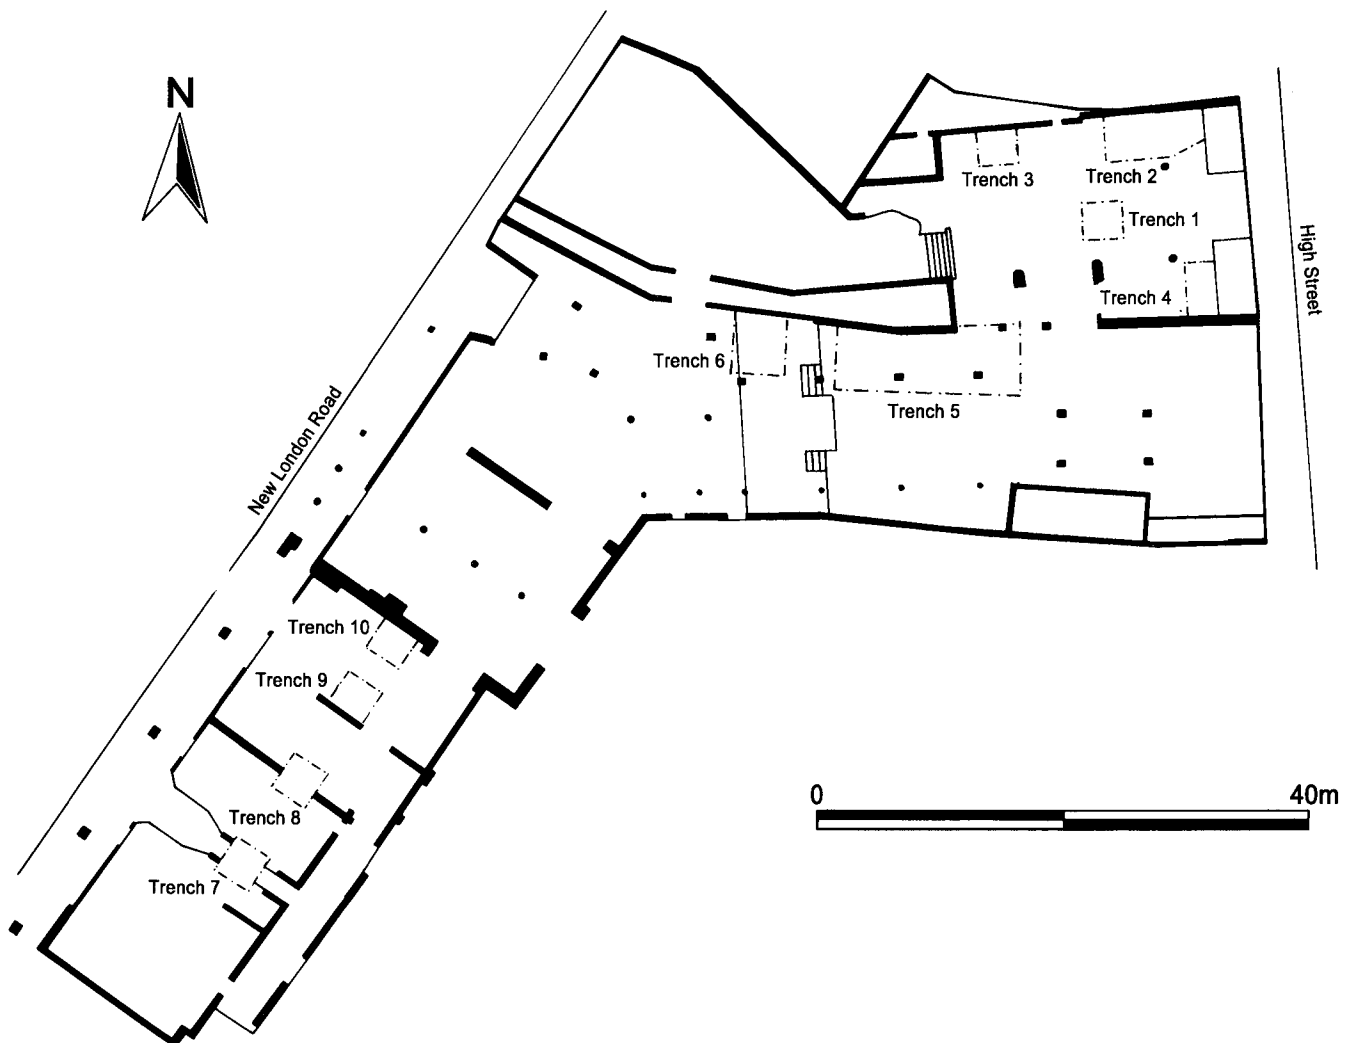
Ground floor plan of 73-74 High Street, Chelmsford, showing the location of Trenches 1 to 10.
